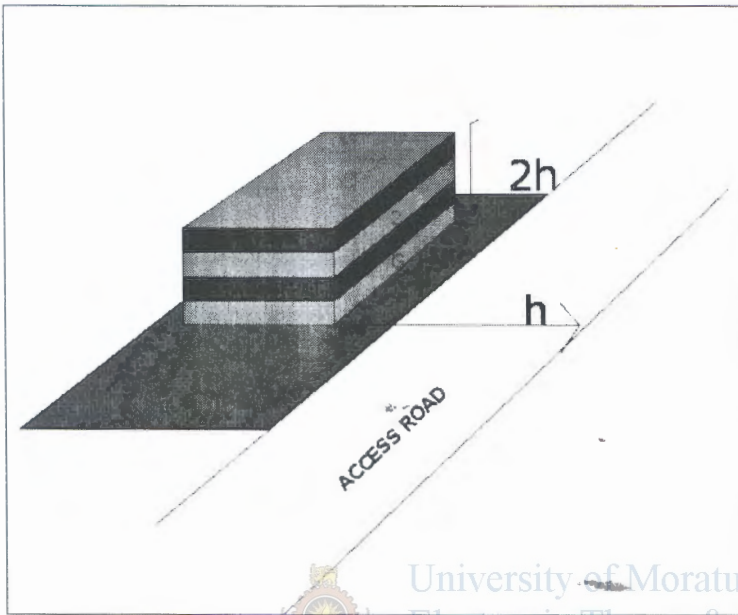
Building Heights Low rise Buildings Regulation 18 (2)
